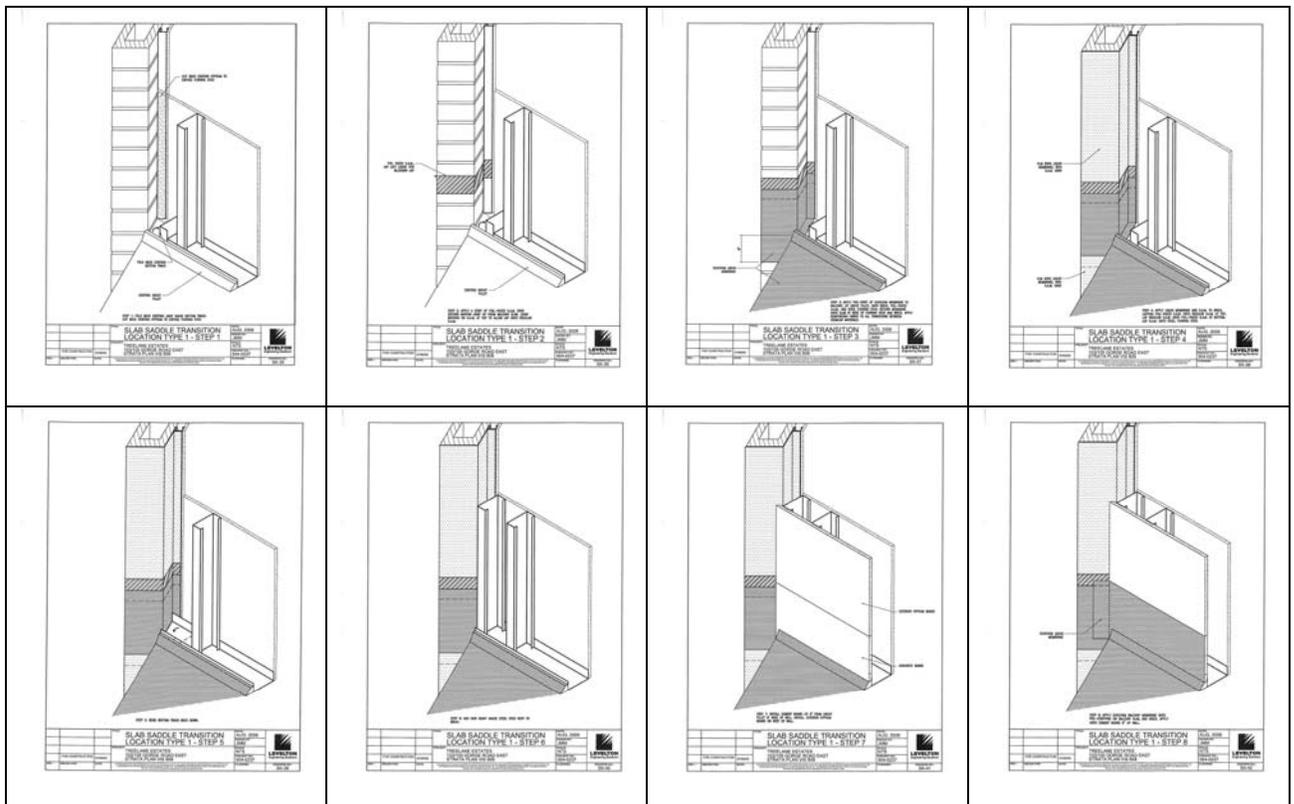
8 of 16 three-dimensional sequenced details to direct the installation of only one of many types of interfaces between the face seal brick structure and the rain screen steel stud and stucco infill wall. The complexity of the geometry, materials compatibility issues, potential for error are always present when complex details such as these are being constructed. Also implied in the many layers of application is the amount of overlap and hence low coverage efficiency of the membranes used at the hybrid interfaces.
